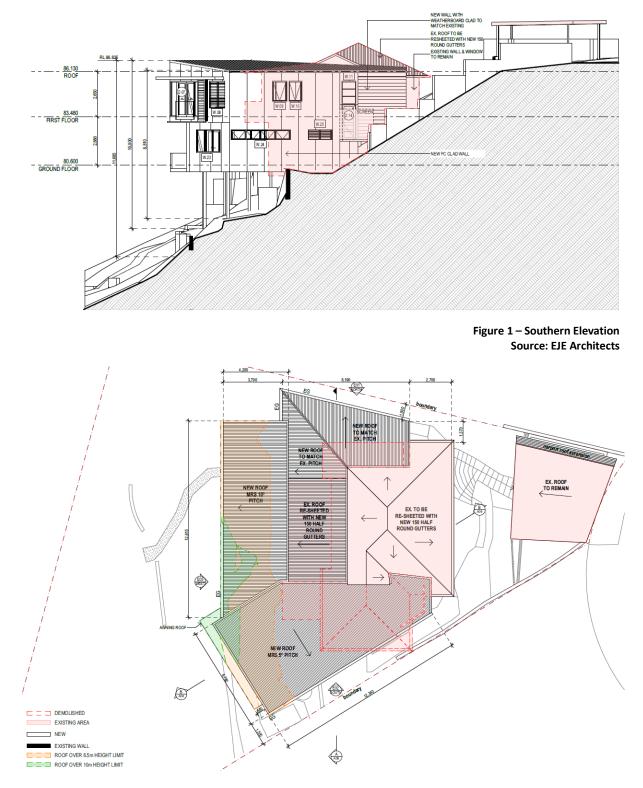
Roof Plan with extent of height breach highlighted in orange (8.5m) and green (10m) Source: EJE Architects
